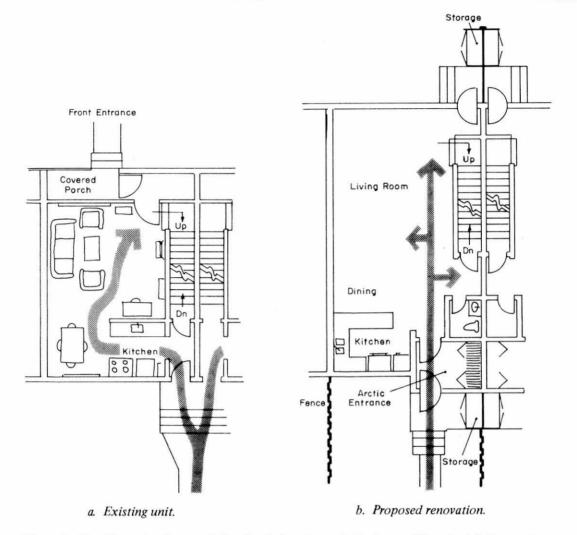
First-floor plan for an existing family housing unit at a large military installation, and the design for its proposed renovation. Heavy lines indicate the typical family's traffic pattern.
